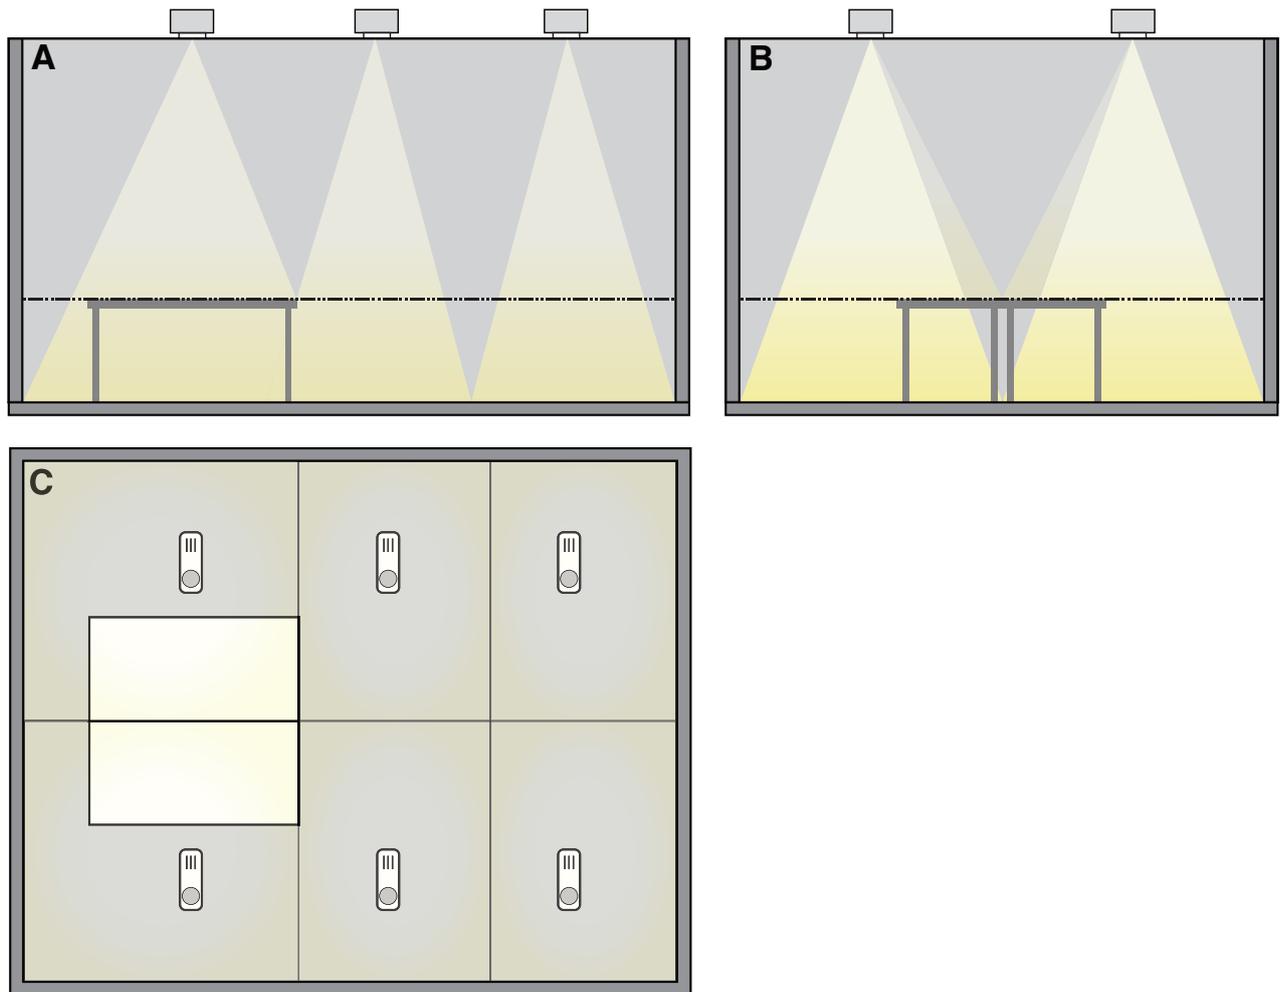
Projector positions and coverage. The dashed line marks the work plane. (A: Longitudinal Elevation, B: Cross Section, C: Ceiling Plan)
